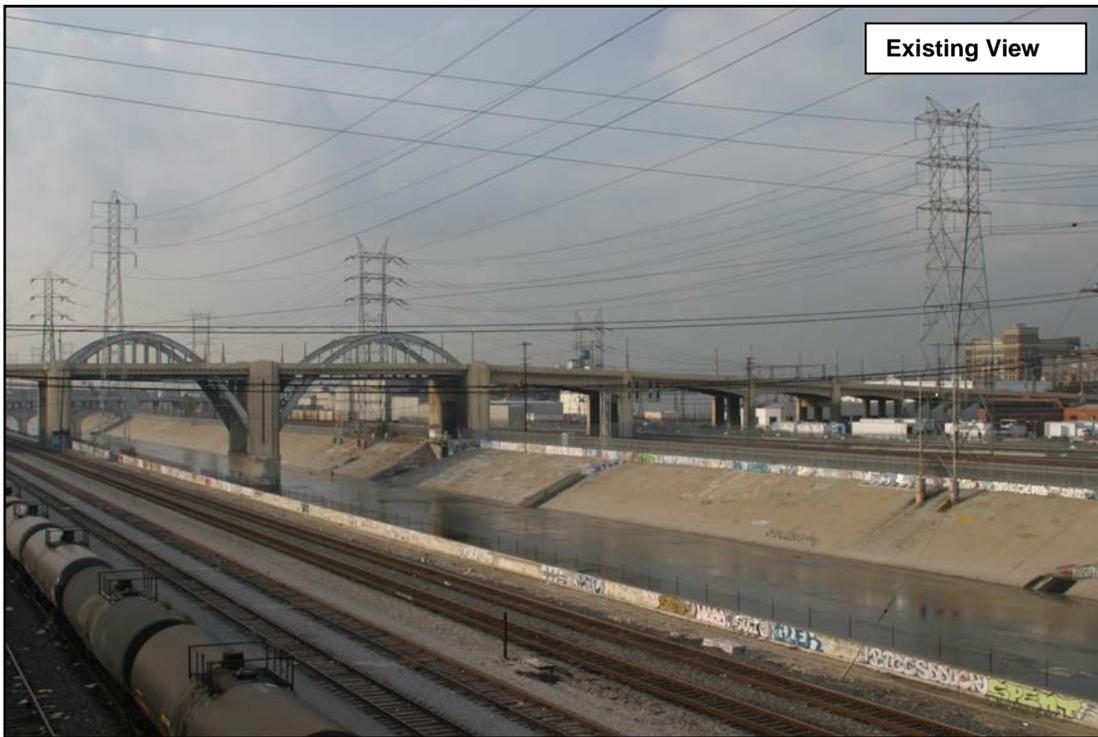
Viewpoint 2: Bridge Type 1 – Replication on Alignment ‘B’ Looking Southwest
